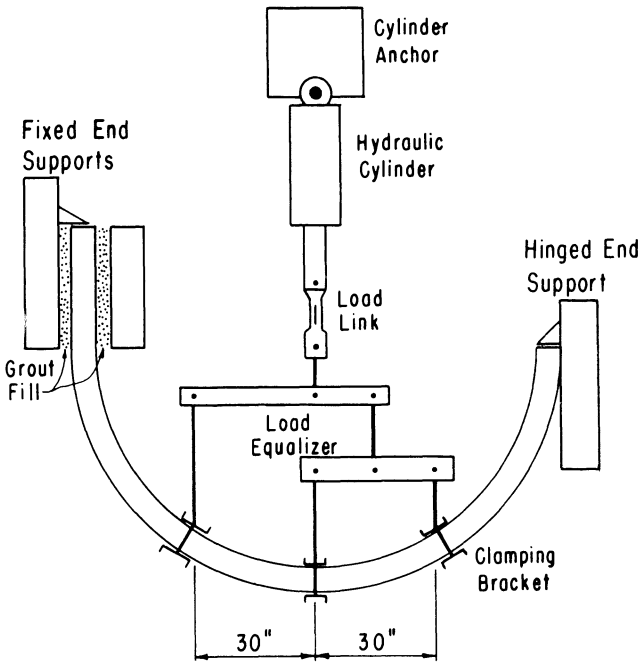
Load and support brackets for laboratory load-testing of model concrete shell arches.
